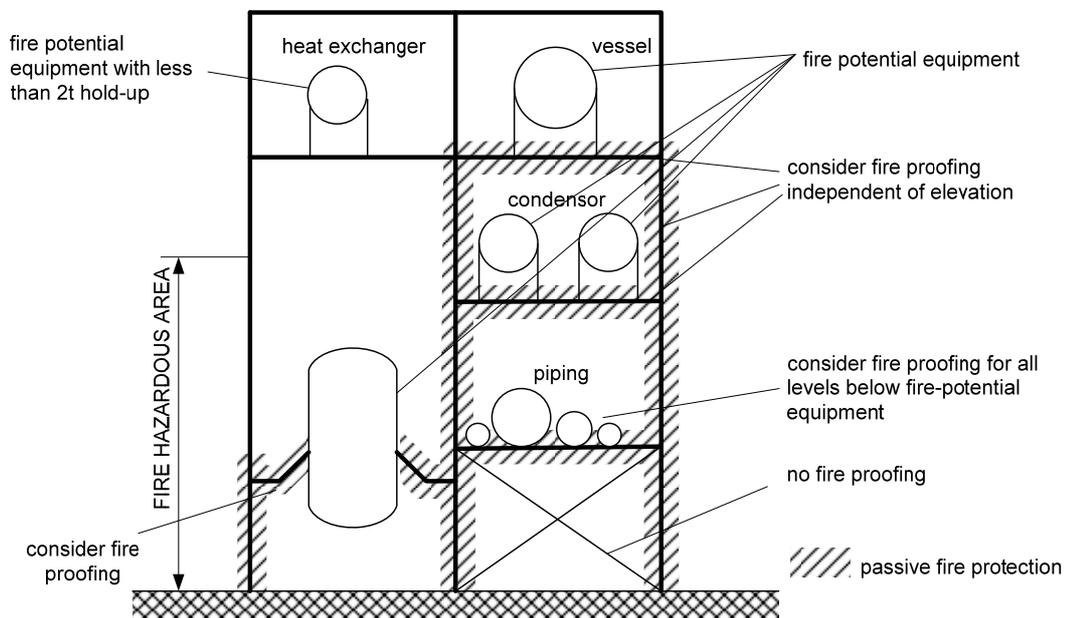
A – Multilevel Structure supporting Fire Potential Equipment >2t content
